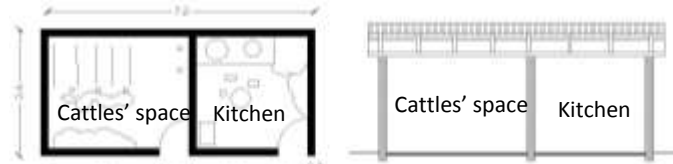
Ato Yohannes's kitchen and cattles' space plan and section
